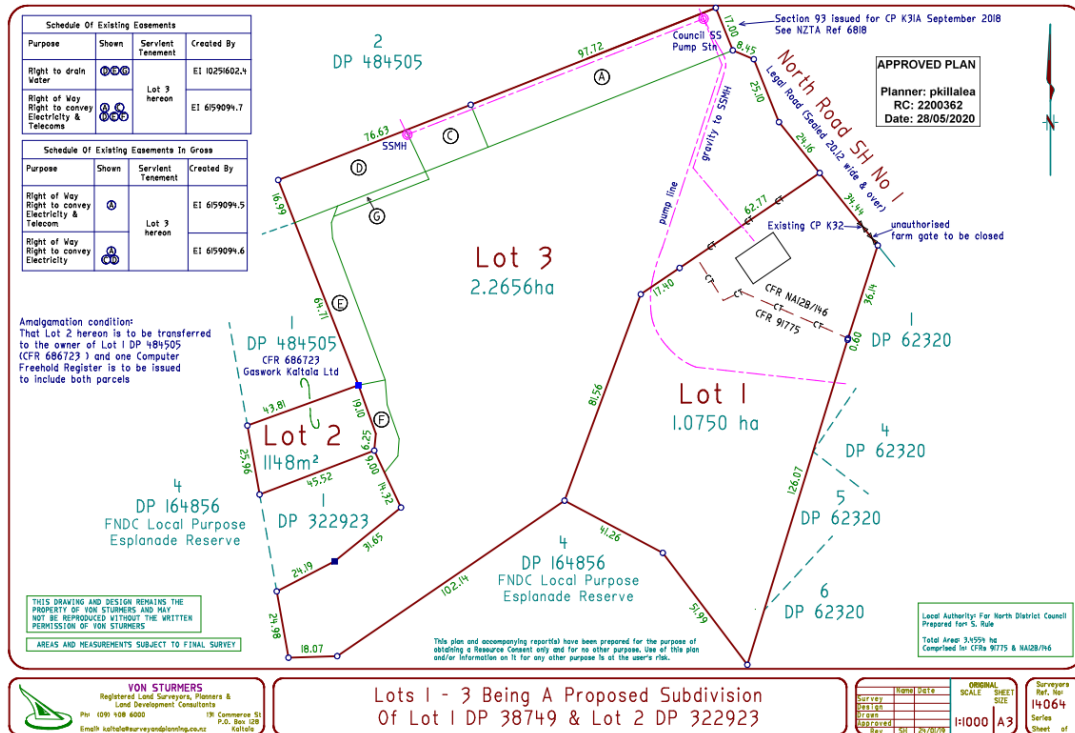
Previously approved scheme plan under RC2200362 which is also subject of this proposal.
